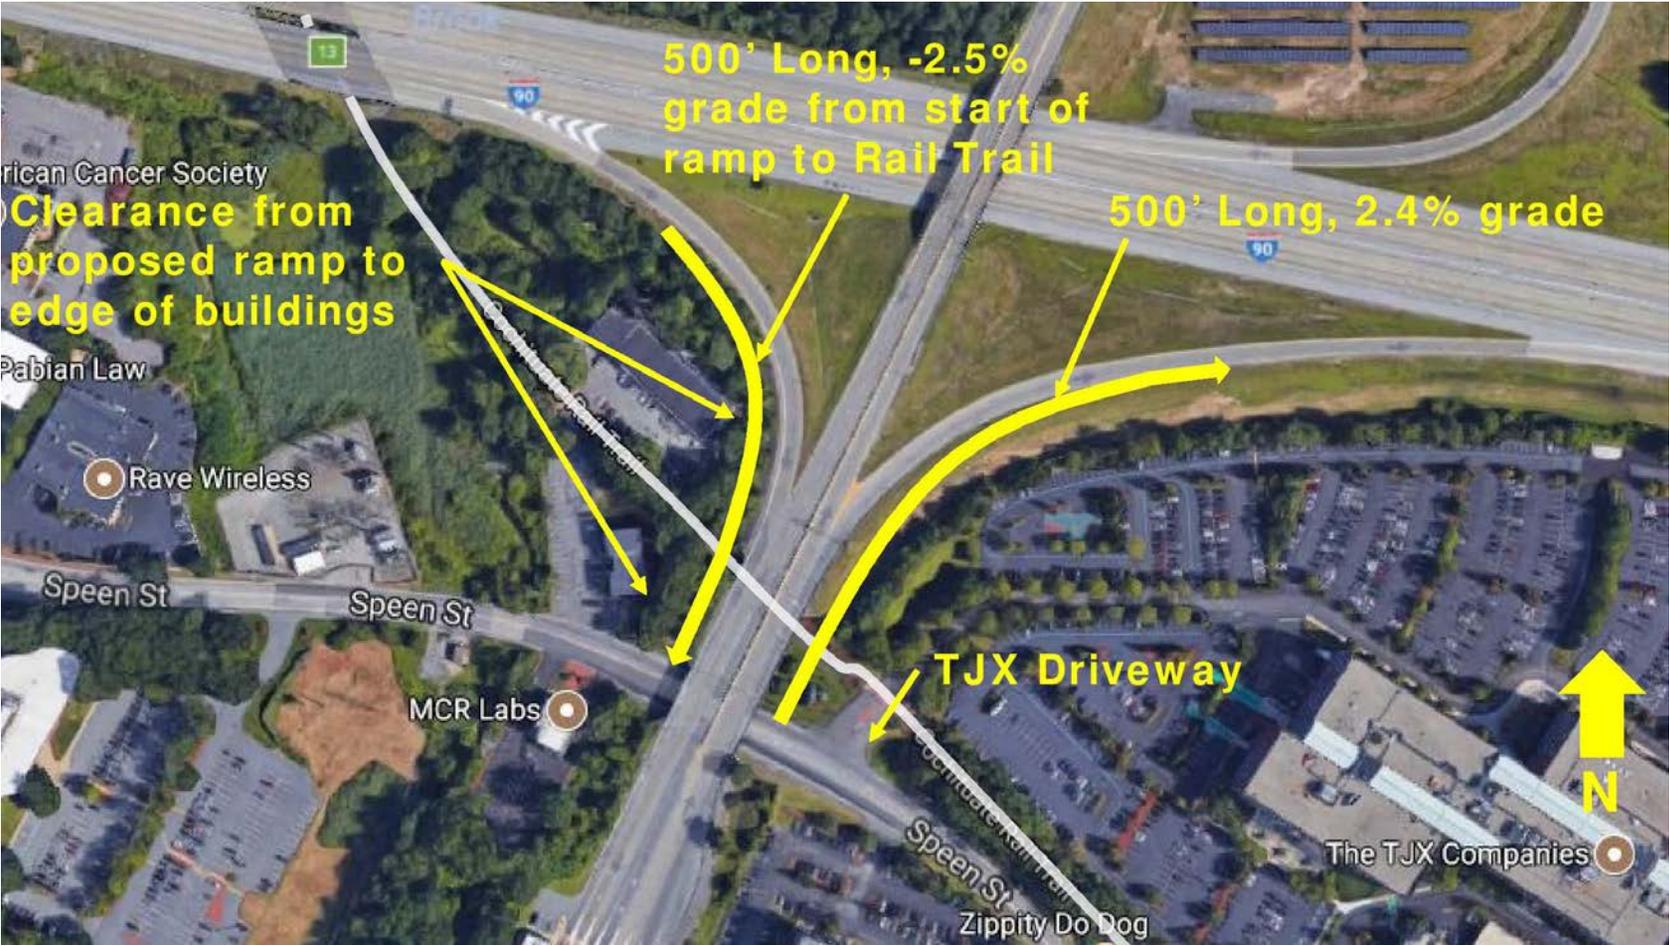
Potential Ramp Alignments to and from Speen Street
